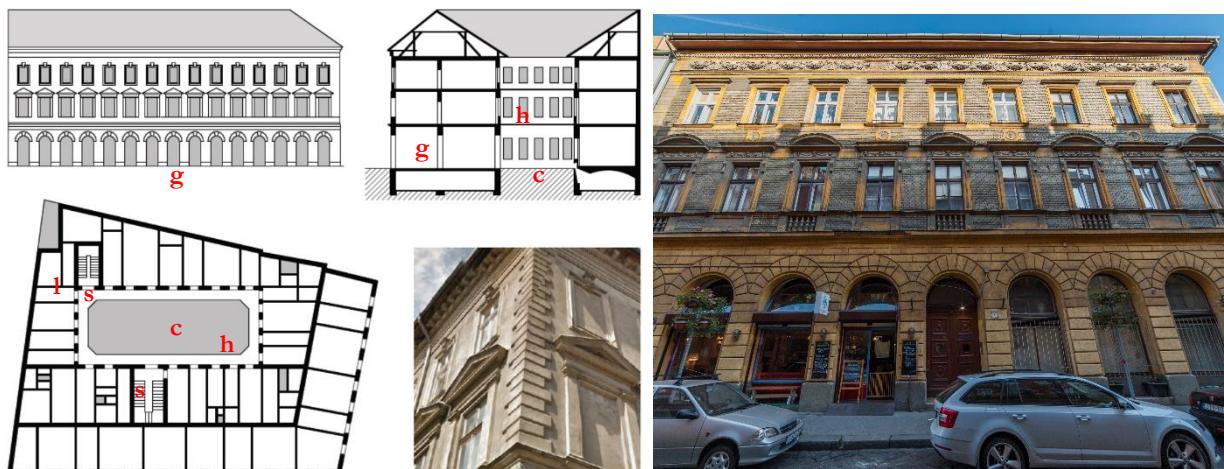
Left: Example of a Historicism building. Façade, layout, section and detail of a building. Right: Other example façades from the case study area. (c = courtyard, g = gate, h = hanging corridor, s = staircase, 1 = common lavatory) (source: Authors' own figure)
